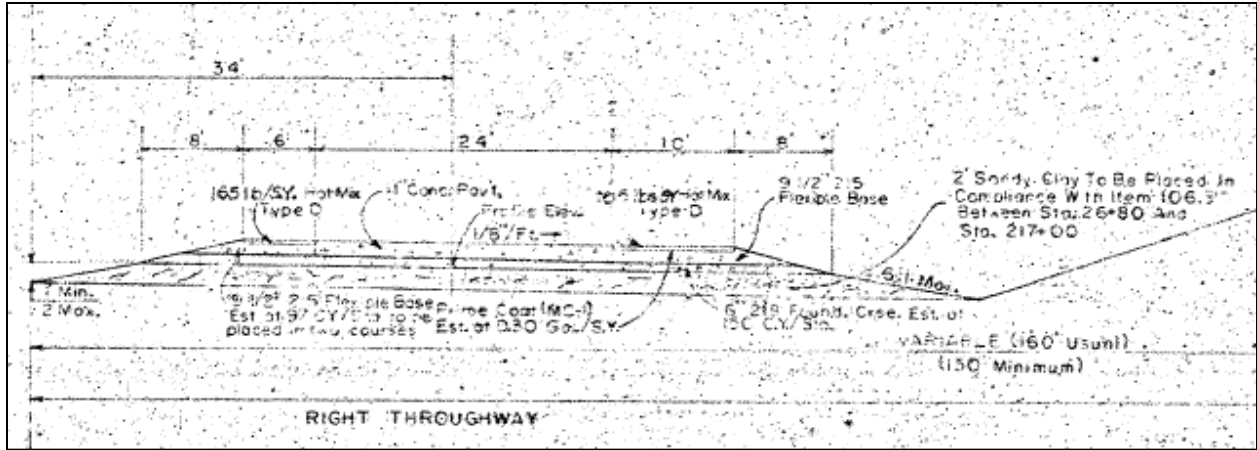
1957 Typical Section—Right Throughway from SH 30 to North of SH 75.
